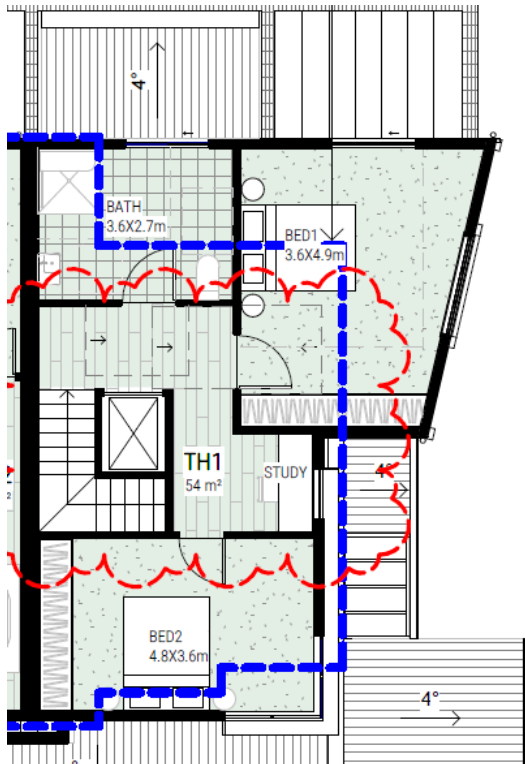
excerpt of the first-floor plan showing that the proposed passenger lift is appropriately located to achieve access within the dwelling
